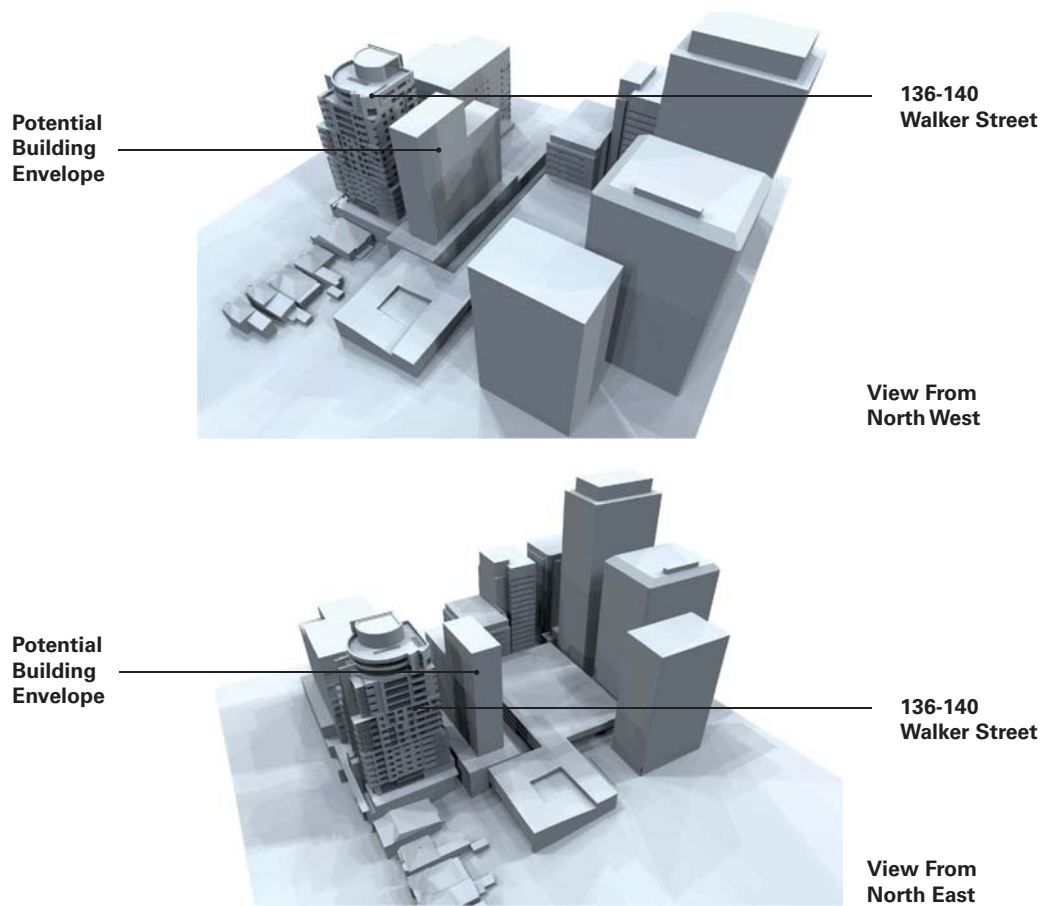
Proposed Development at 136-140 Walker Street and Potential Building Envelope at 3-11 Ward Street
